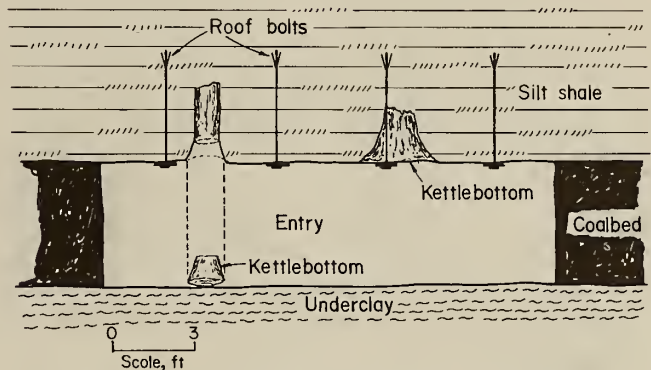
Subtype G₄ roof failure attributed to kettlebottoms.
